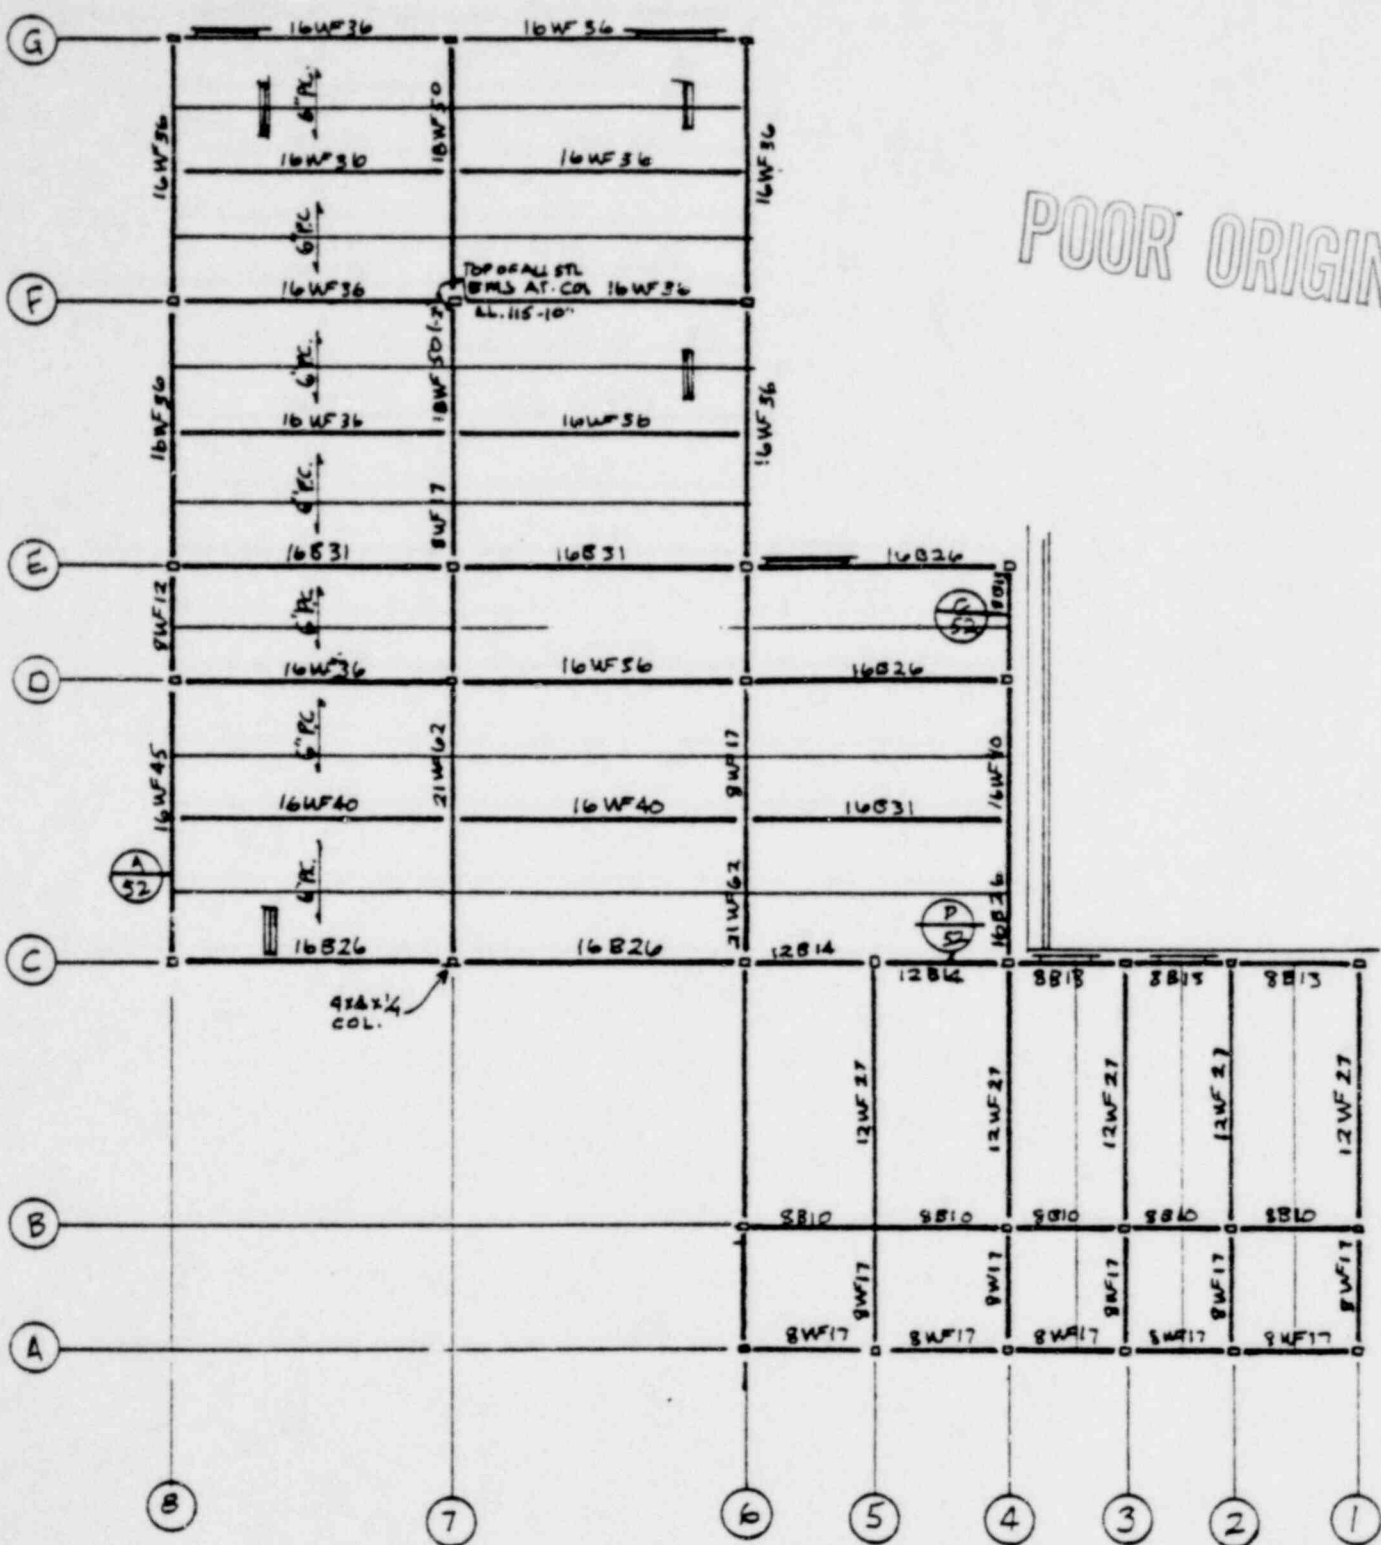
JN-4 ROOF FRAMING PLAN
